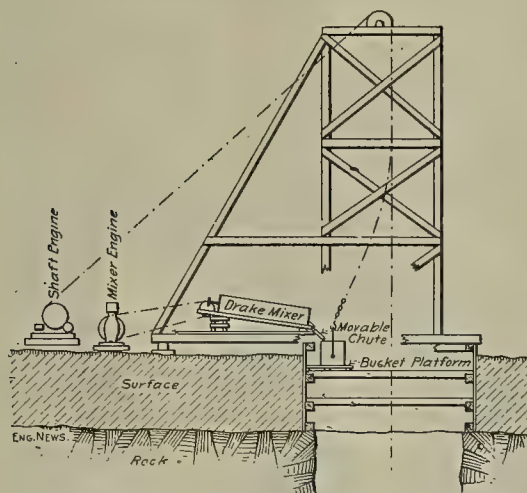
General Layout of Concrete Plant for Lining Elliptical Shaft.
